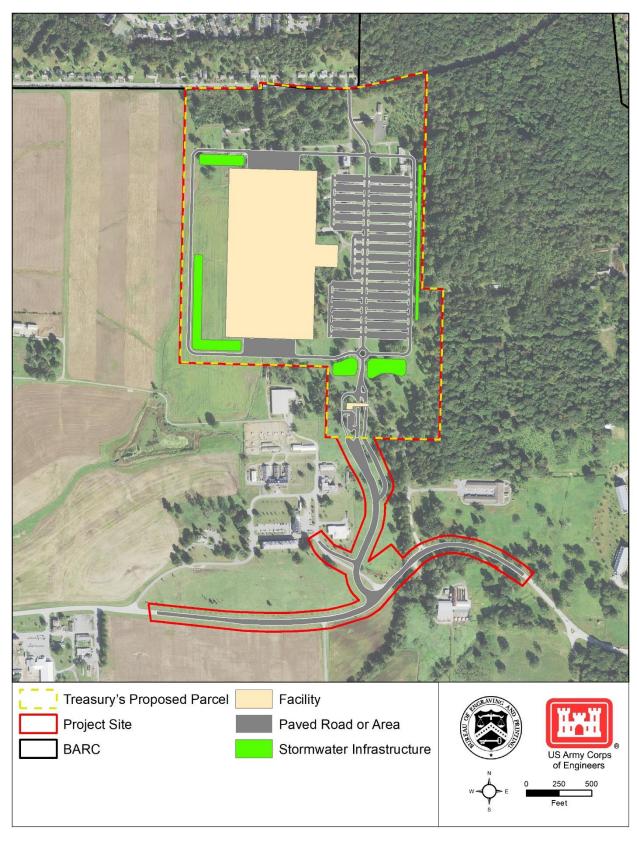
Concept Site Plan of the Preferred Alternative
